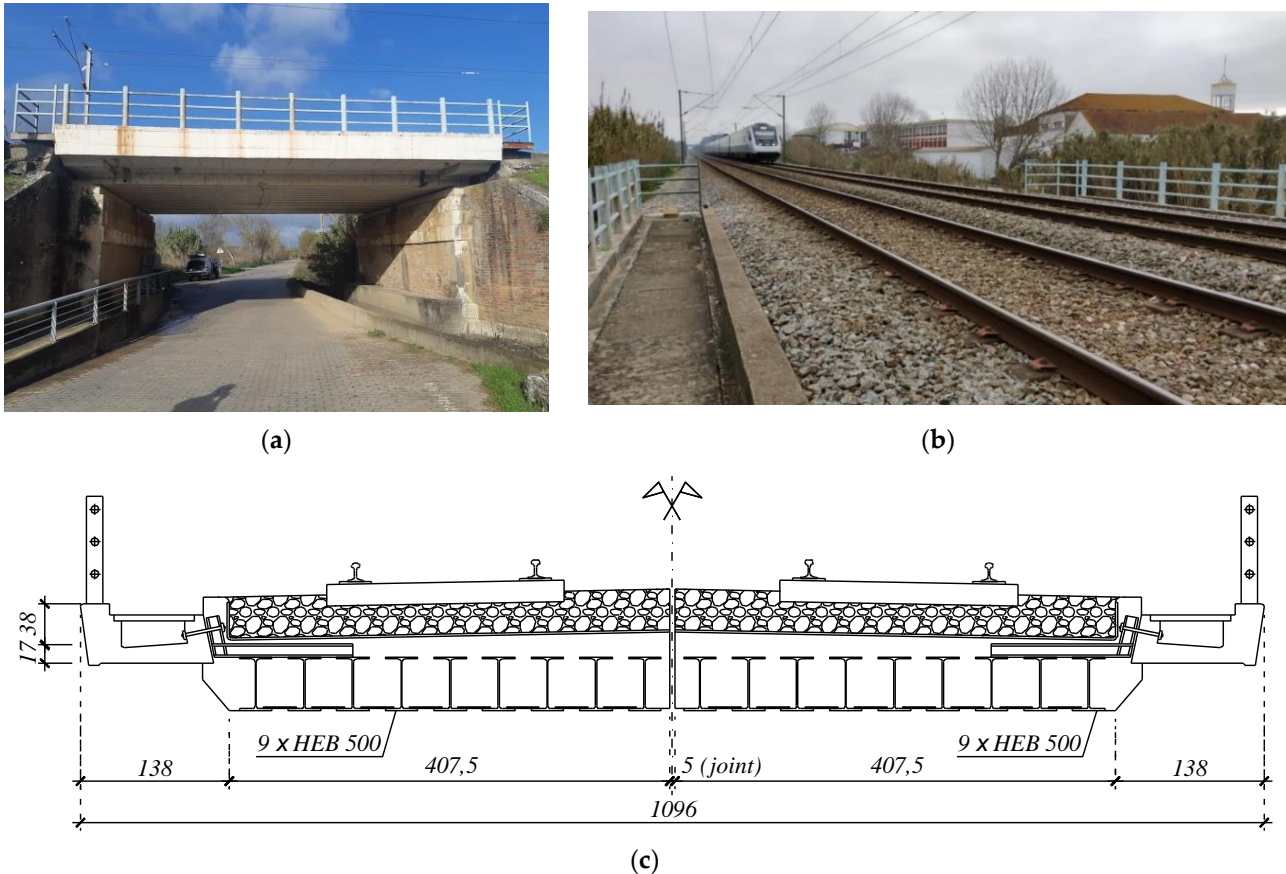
Cascalheira bridge: (a) global view; (b) track view; (c) cross-section (dimensions in cm).
